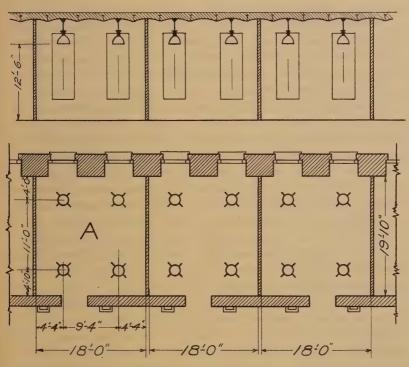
Plan and Elevation. Typical Room A. State, War and Navy Building, Washington, D. C.
